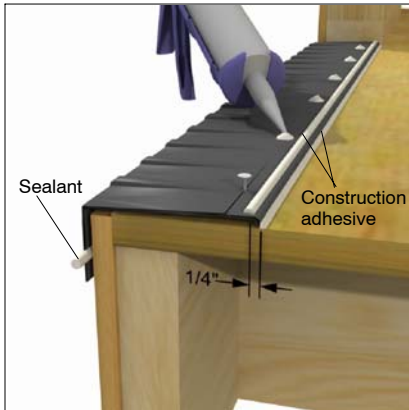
(Doors) Seal fasteners and apply construction adhesive
